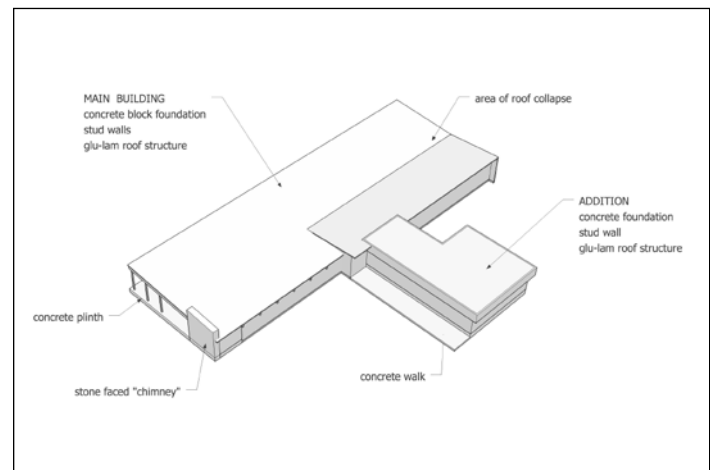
Plan-view of the Old Kake Elementary School depicting architectural features, additions, and roof collapse (© Olberding White Architects 2014).
